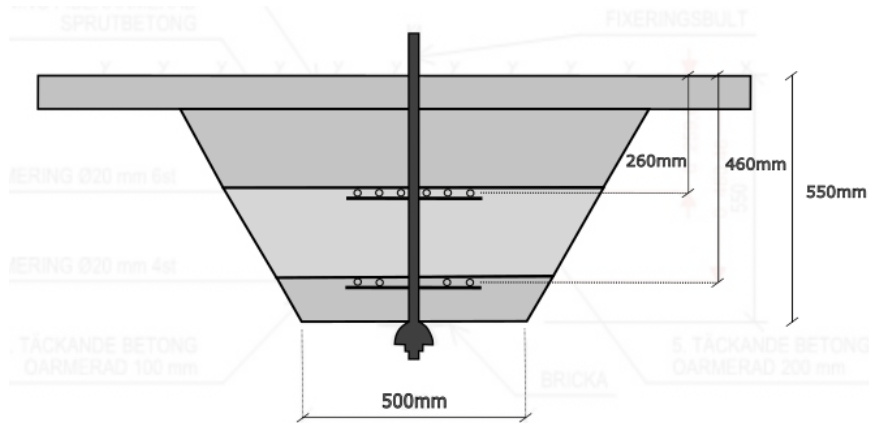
Drawing of the cross section for reinforced shotcrete arches as general support for rock class four and span class B and C (Lesell, 2016) (modified by the author).
